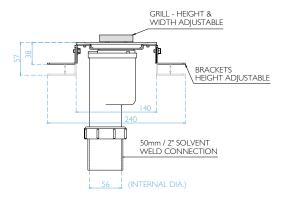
# DETAIL: VERTICAL TRAP - FLOOR GRILL
